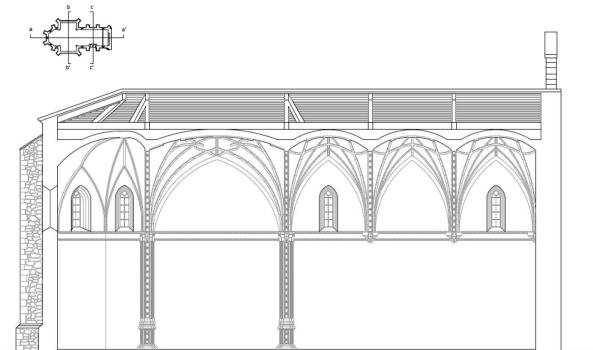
Reconstruction of the longitudinal cross-section of the Church of La Piedad. Drawing: Mireya Ibarra Pérez.
